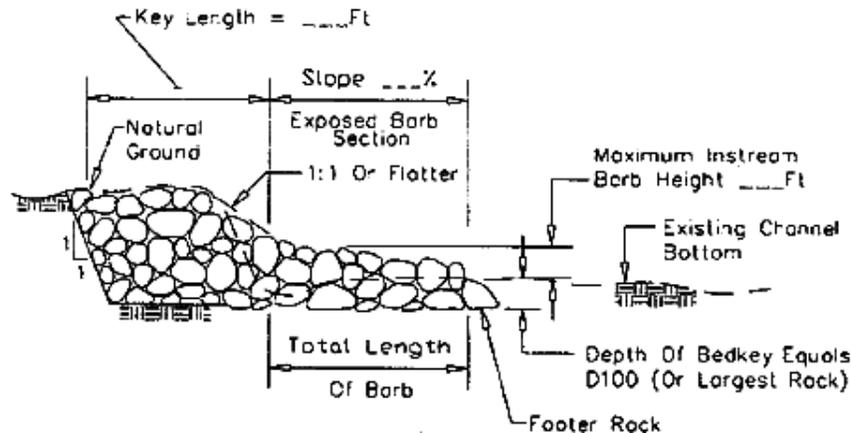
Typical Stream Barb Centerline Profile (Evans & Kinney, 2000)
